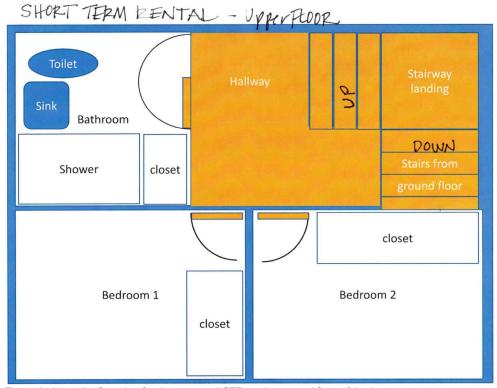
shows the floorplan for the proposed STR on the second floor of the home.
